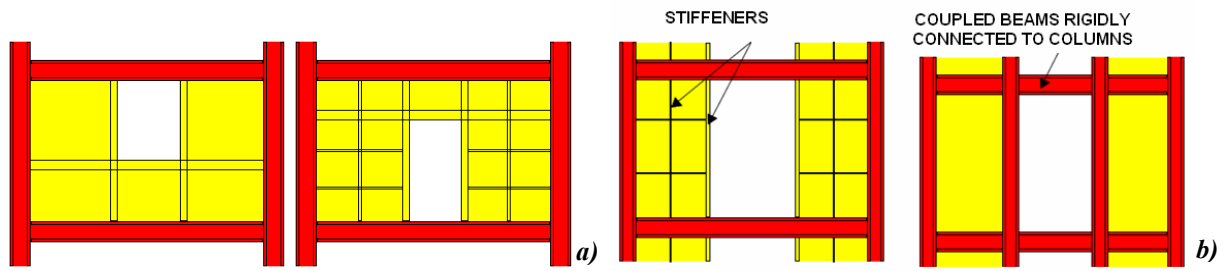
Openings in Simple Steel Plate Shear Walls (a) and Adoption of Coupled Steel Plate Shear Walls (b)
